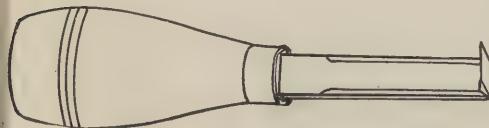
KNIFE OR “FRENCHMAN” USED IN MAKING “RODDED JOINTS.”
